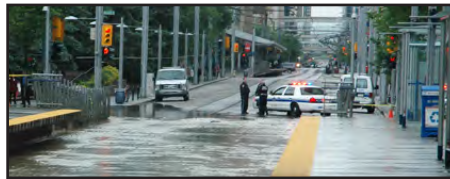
INFRASTRUCTURE DAMAGE
